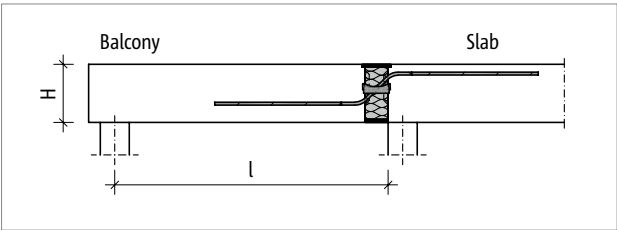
Schöck Isokorb® T type Q-E-V: Static system
